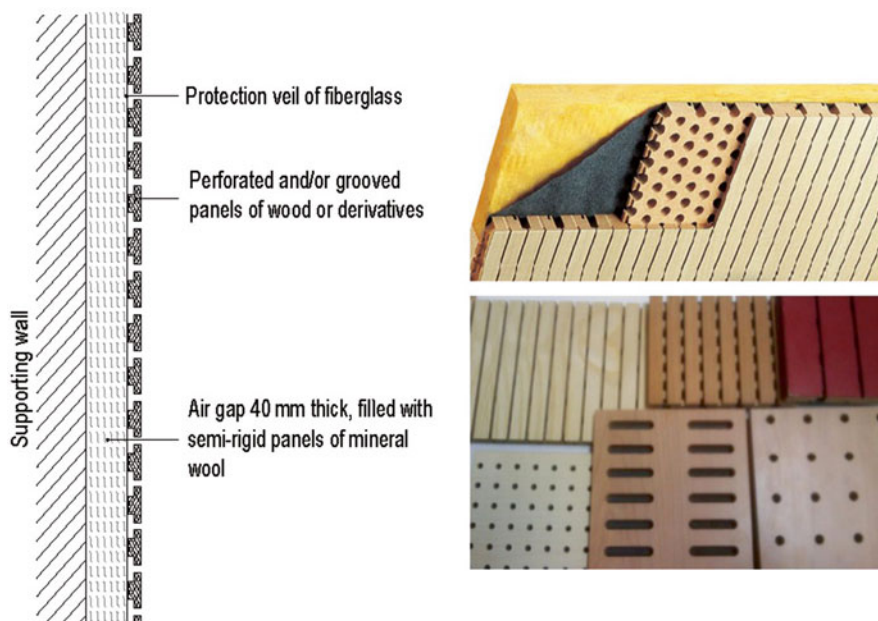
Examples of constructive solutions used as absorbent linings in walls
